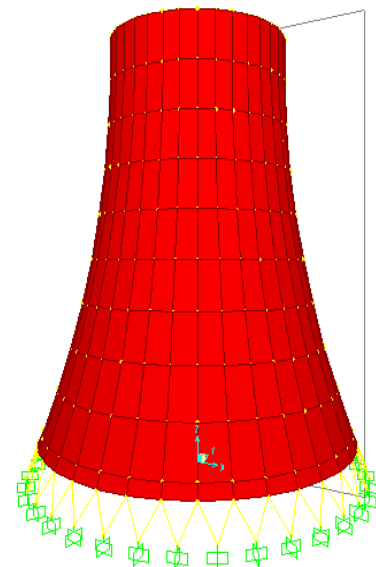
Hyperbolic cooling tower with inverted V-frame column support.
